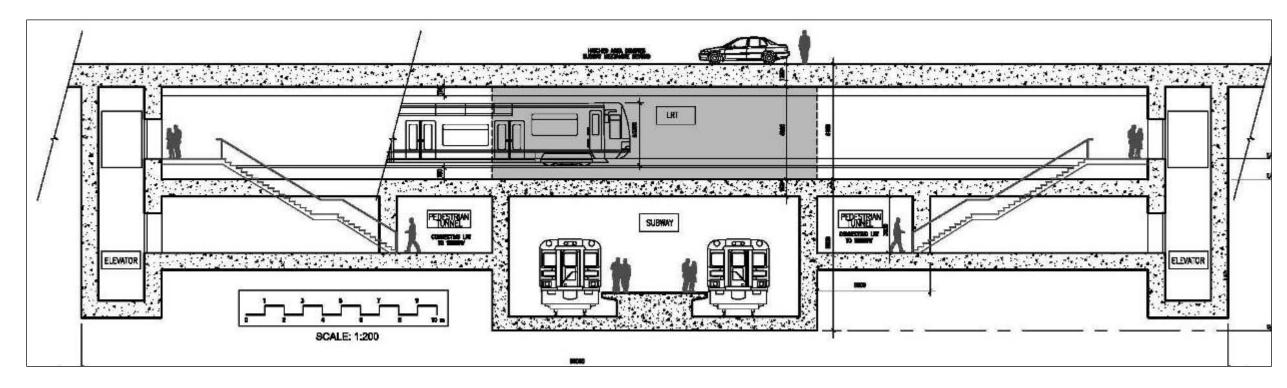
Plan View and Cross Section of Underground Solution at Finch Station
